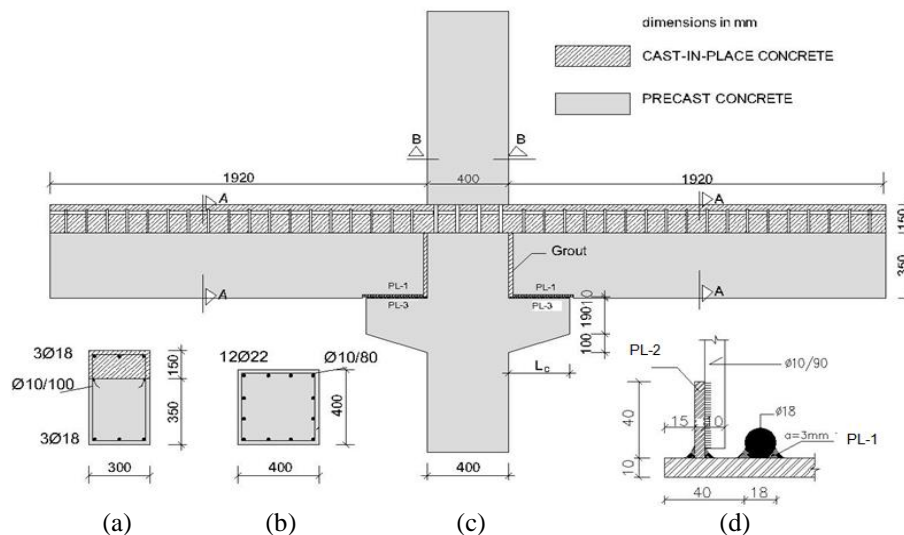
(a) Beam cross-section, (b) Column cross-section, (c) Precast beam-column connection, (d) corbel rebar (Girgin et al., 2017a).
